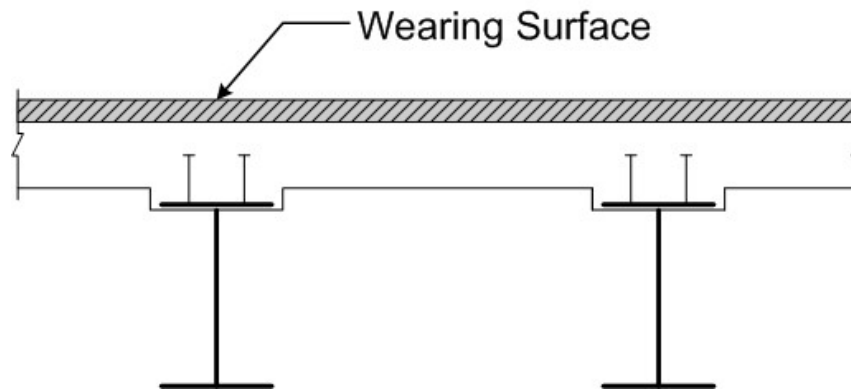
Composite Concrete Deck and Steel Beams with Shear Studs
